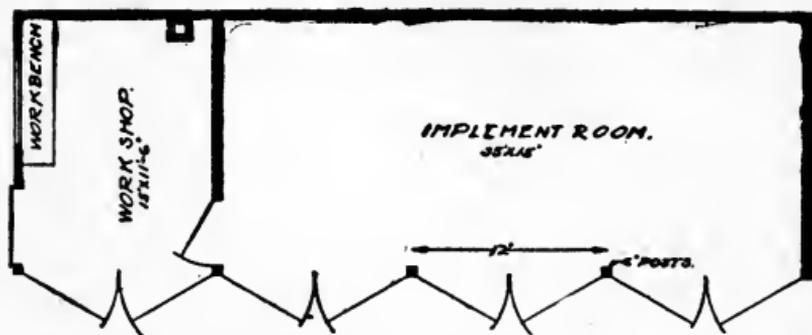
Floor Plan of Farm Implement Shed, Showing the Workshop in One End of the Building, Handy to the Implement Storage Room.
